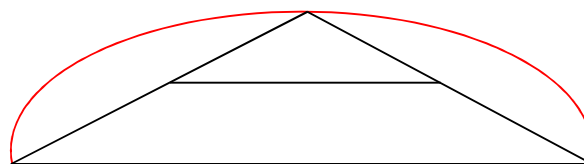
Scheme of overlaying the contour of the designed roof on a typical cross section
